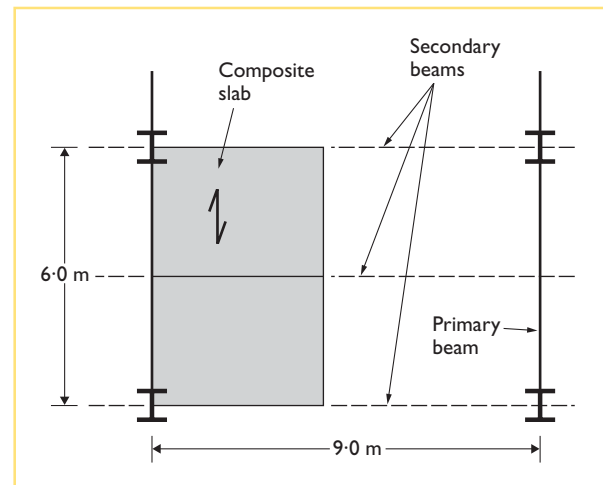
A typical layout for primary and secondary beams. ©The Steel Construction Institute (SCI). See also Figure 11, page 16.
